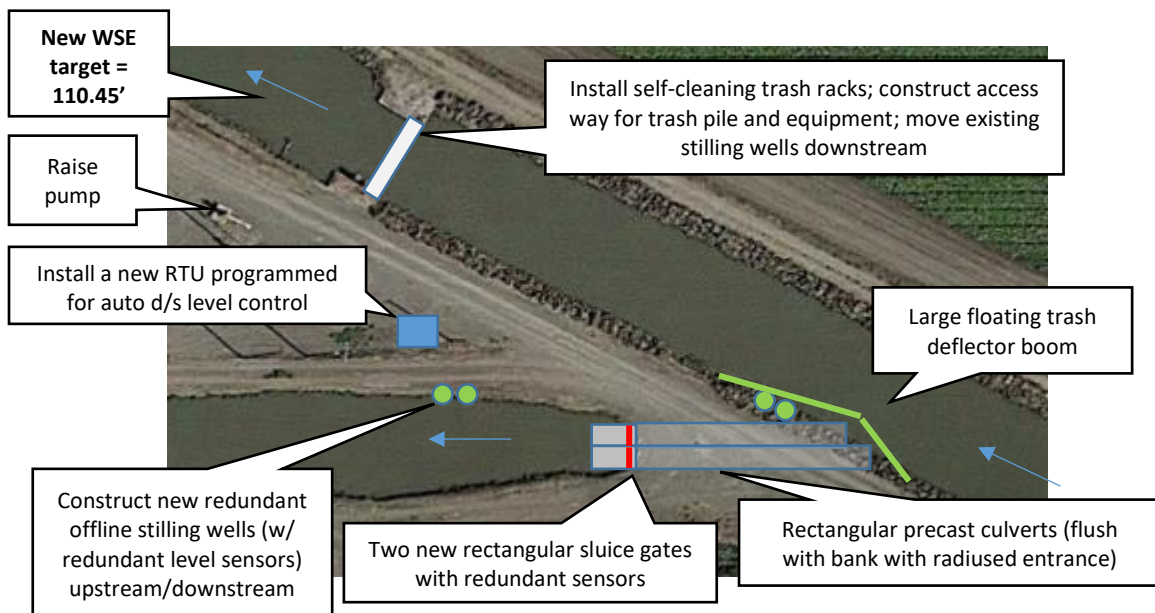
Conceptual Branch 5 Canal headworks recommendations, plan view
